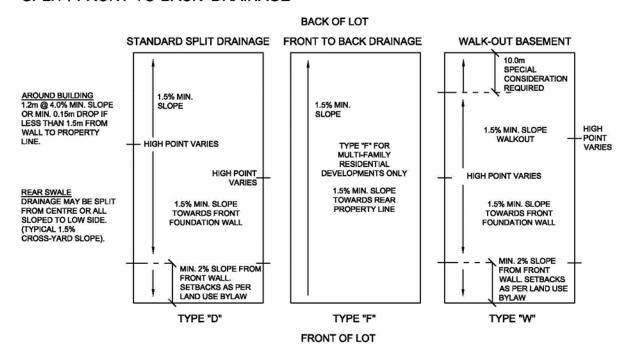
B – Typical Lot Grading Details – Split / Front-to-Back Drainage
